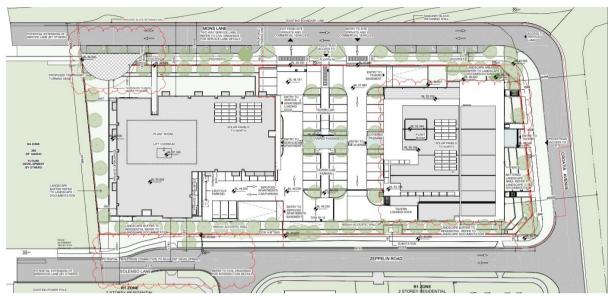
Proposed Modified Site Plan - DA-698/2019/A
